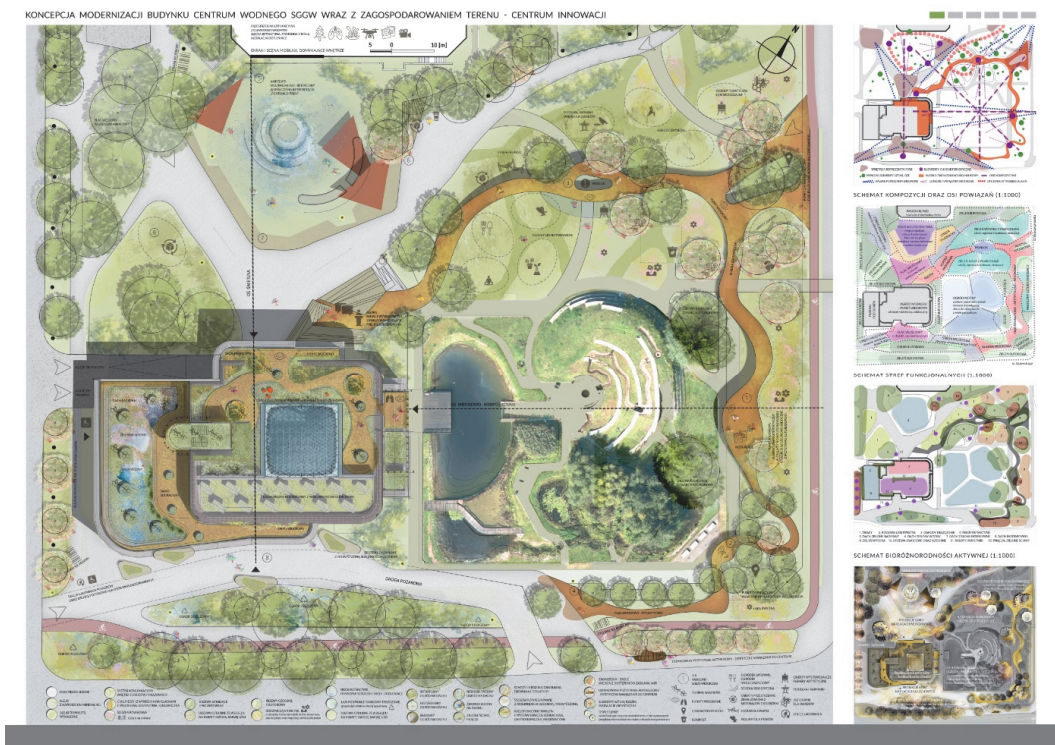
Concept project of SGGW Water Centre with neighbouring area. Site plan
